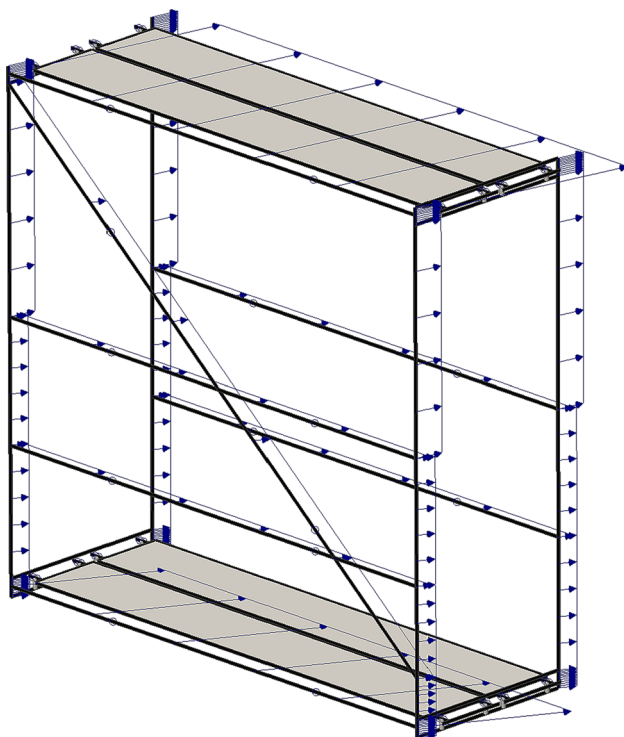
Continuous load applied to structural elements of the scaffolding in the FE system
